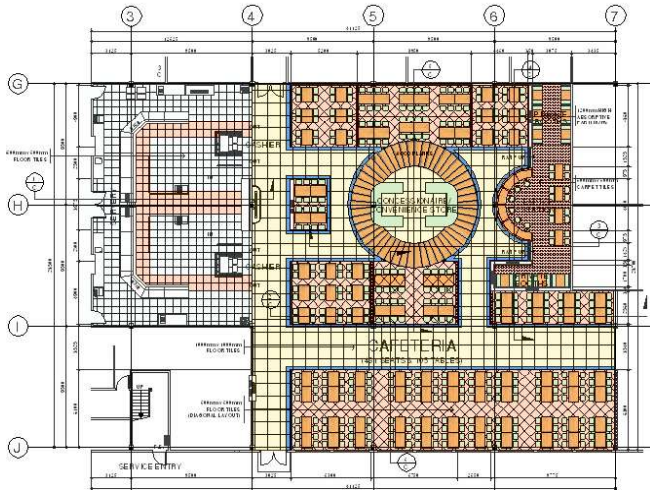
Proposed plan of Intel CV1 Cafeteria
